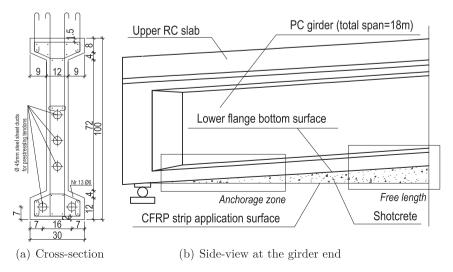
Cross-section of the prestressed concrete (PC) girder and side view including the upper RC slab with the levelling material of the prestressed concrete girder.
